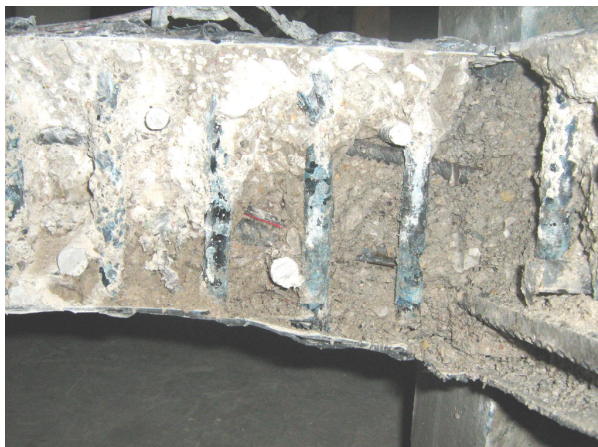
Failure surfaces and crack patterns of specimen OS25
